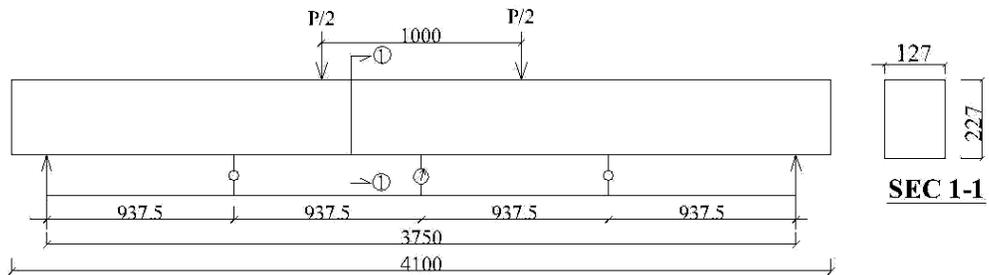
Loading Arrangement for Testing of all Beam Specimens
